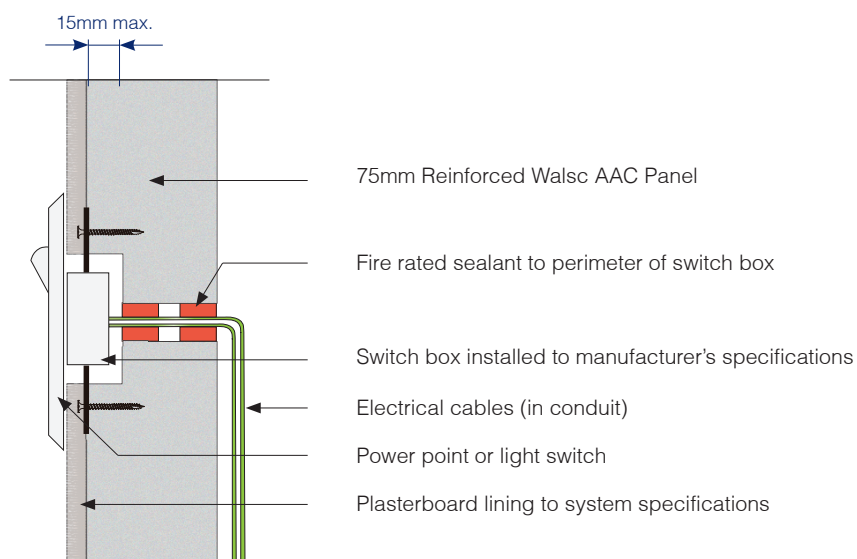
Service Shaft Wall Option 1 Power Switch / Outlet Detail
